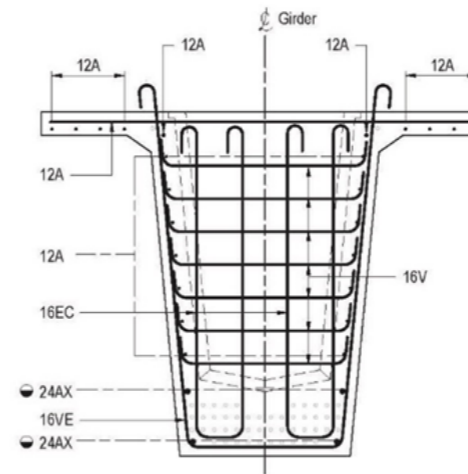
(h) - Example Super-T girder bridge drawings - Sheet 8
